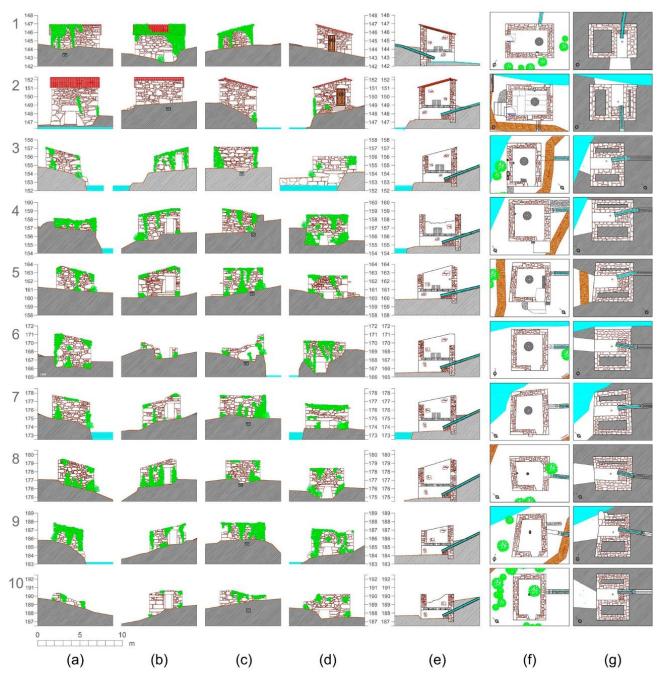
2D current state: a) North elevation; b) South elevation; c) East elevation; d) West elevation; e) Section; f) Milling room plan; g) Lower chamber plan.
